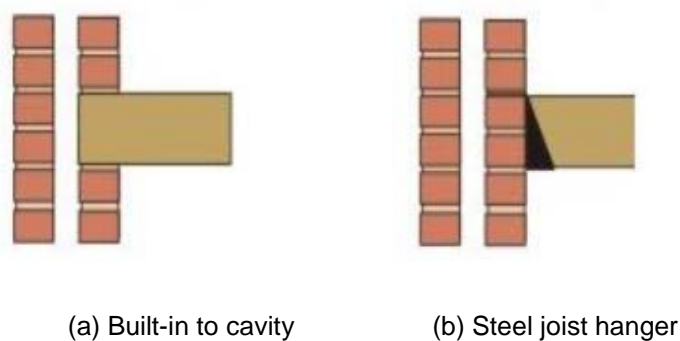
1930s cavity wall connections in the UK (Eveleigh 2009)
